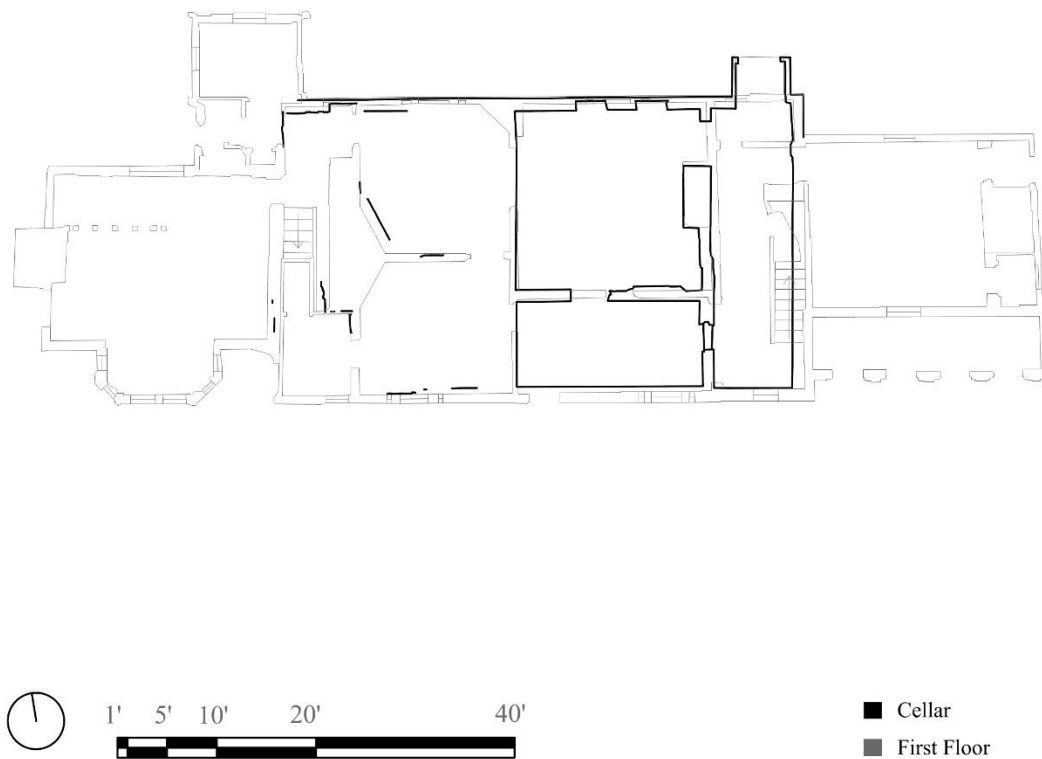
The cellar floor plan overlaid over the first-floor plan shows that the cellar under Campaign Two and Campaign Four align with the layout of the first floor of Campaign Two and Campaign Four. Since the cellar wall that falls under the wall dividing the two rooms in Campaign Two is a One-to-three bond wall, not an English bond wall, it is probable that this wall was added later.
